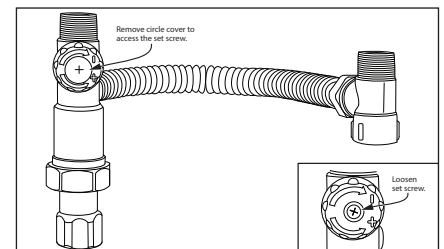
Install the provided mixing valve on the primary cold water inlet line and hot water outlet line of the hot water storage tank.
